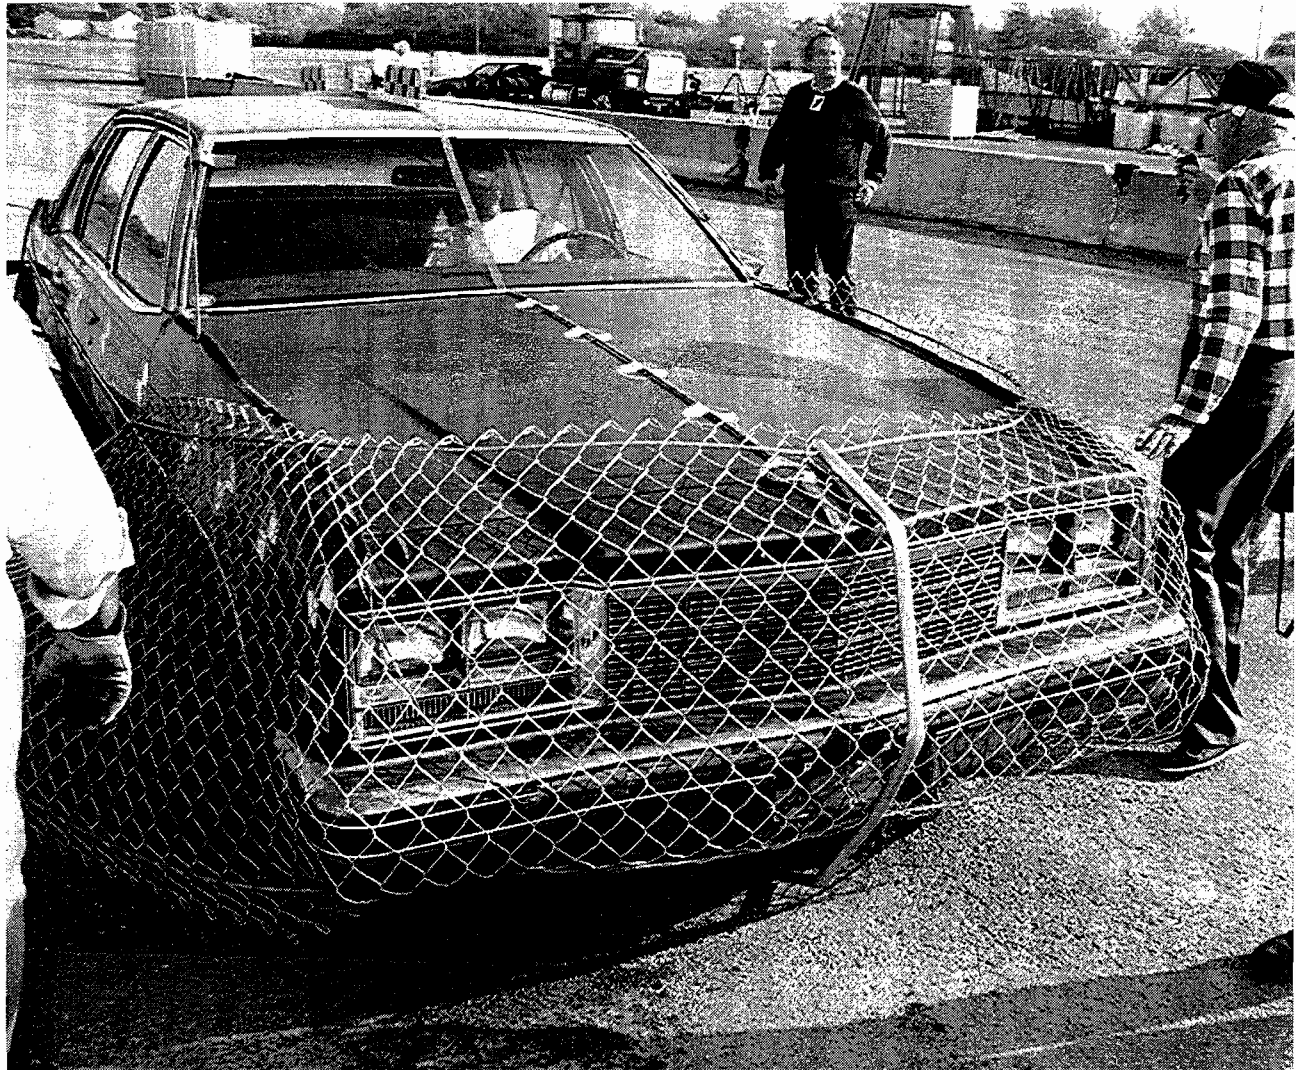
Vehicle Captured by Dragnet Assembly
